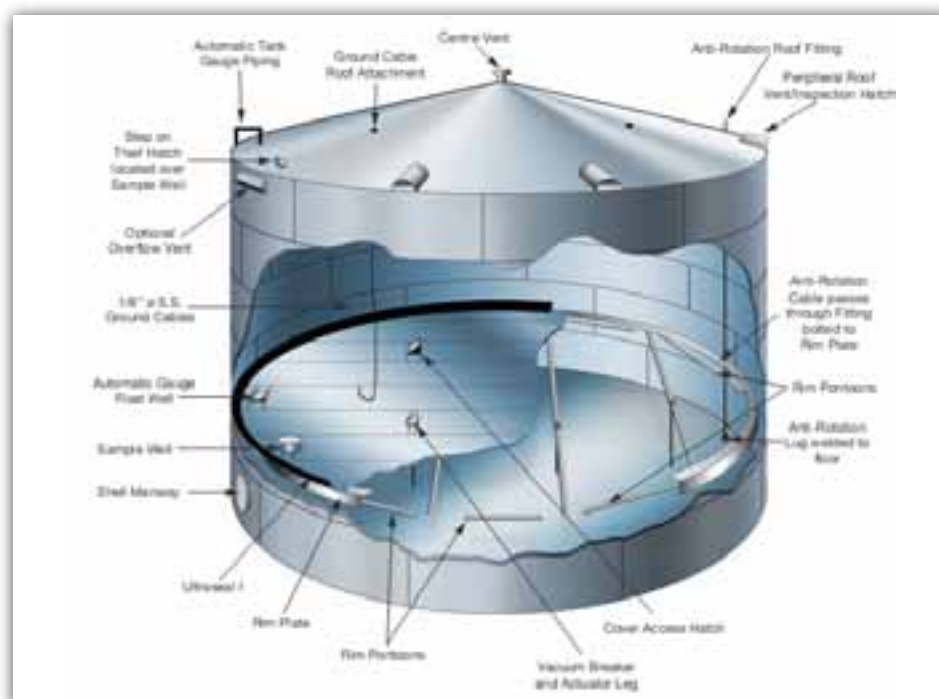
Internal Floating Roof Tank<sup>1</sup>
